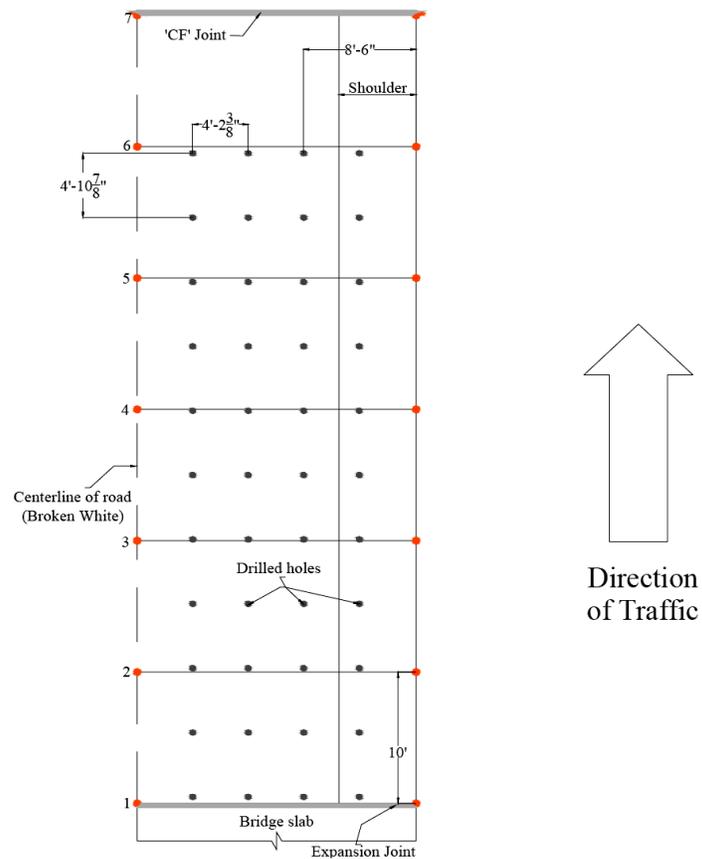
Location of holes drilled on an approach slab (White et al., 2005)
